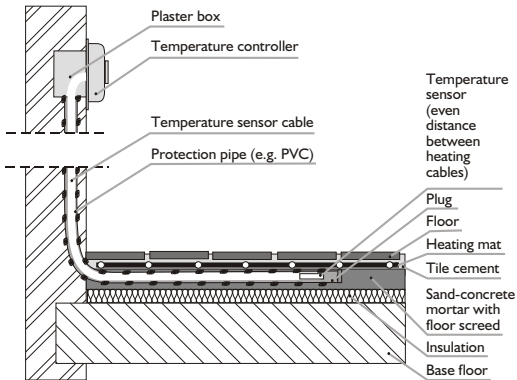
Installing the floor temperature sensor with ELEKTRA heating mats used.
